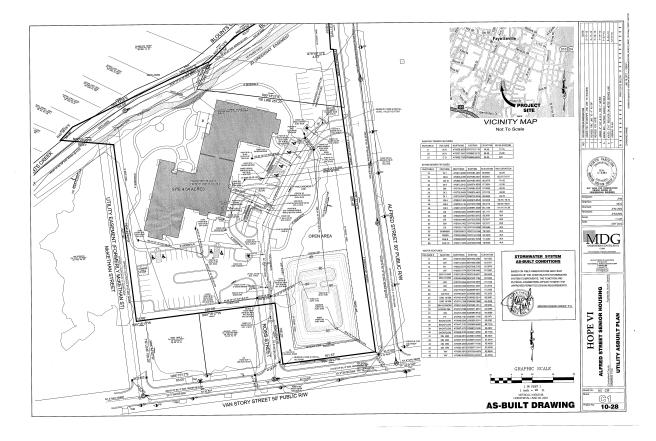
Example Record Drawing of new utilities including stormwater infrastructure as well as the stormwater BMP
